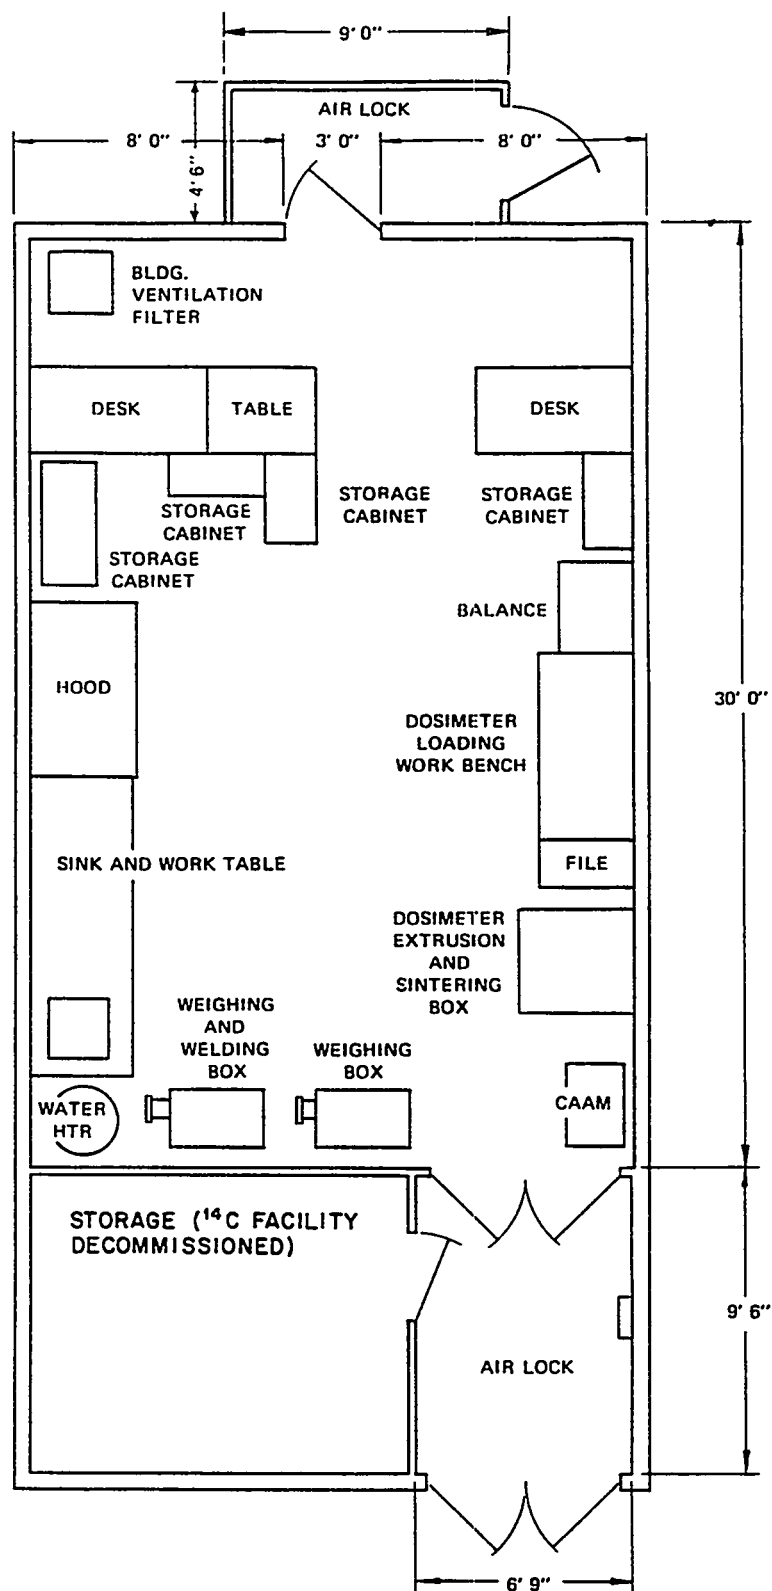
Floor plan of Building 3033-A—Actinide Fabrication Facility.
